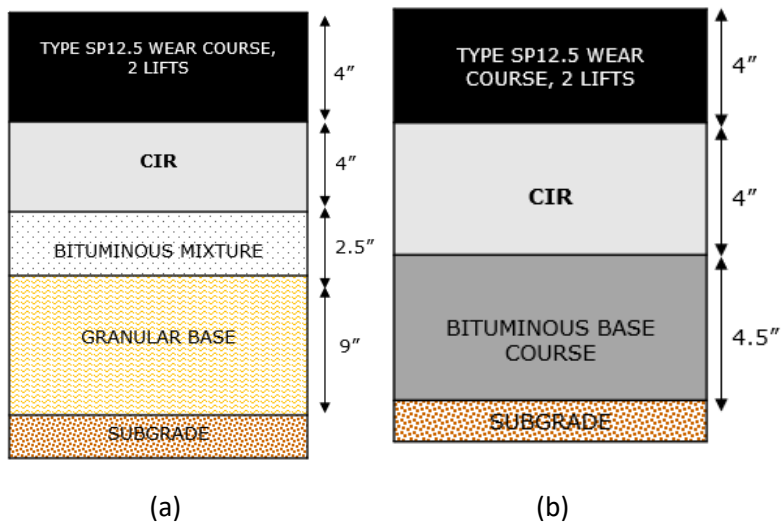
CSAH 18 final pavement cross section (a) Section A-D (d) Section D-F
